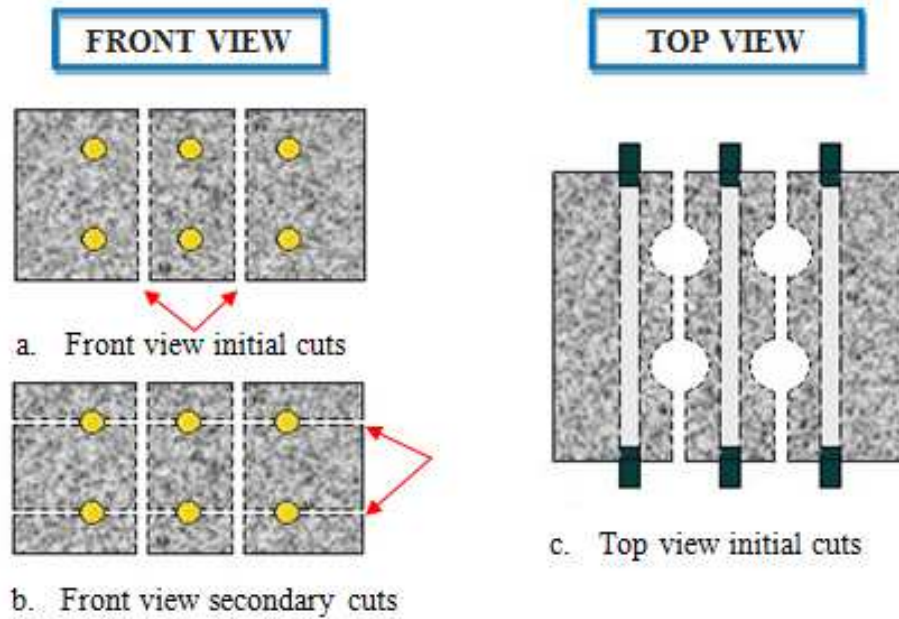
Schematic illustration of the concrete sectioning for specimens as listed in dissection steps 4 and 5 above
